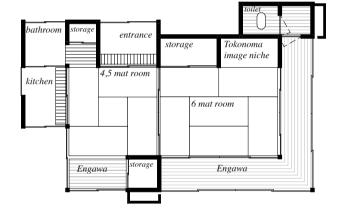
Small Guest Residence at Shorinzan Temple in Takasaki, Floor Plan
